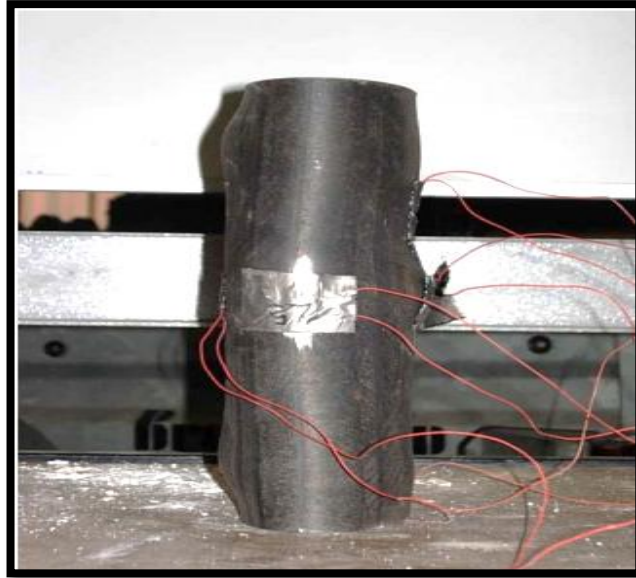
Typical failure mode of composite EHS (Lam and Testo, 2008)
